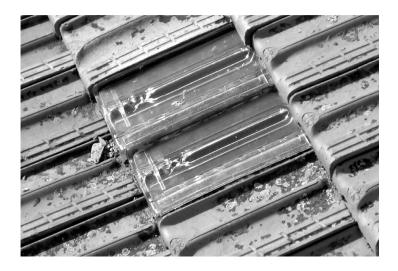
Use of Saint-Gobain glass tiles on the surface of pitched roof facing to the south-east.
